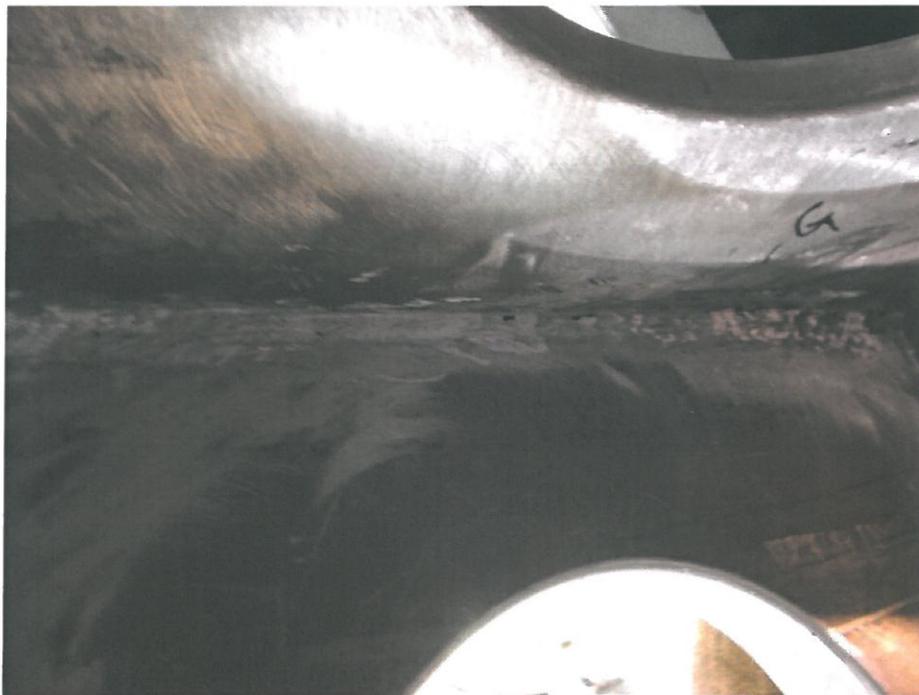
An Area on the Back Side of the Detail 33 Welds where the Blow-Through Material has been removed with a Handheld Tool Bit.
